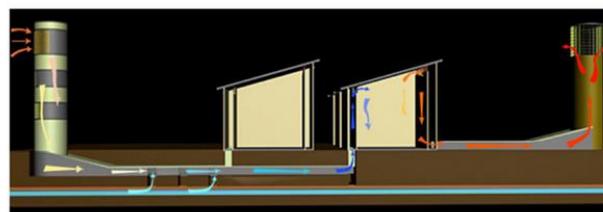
Air moves in a building through wind tower, underground canal and solar chimney [3]
